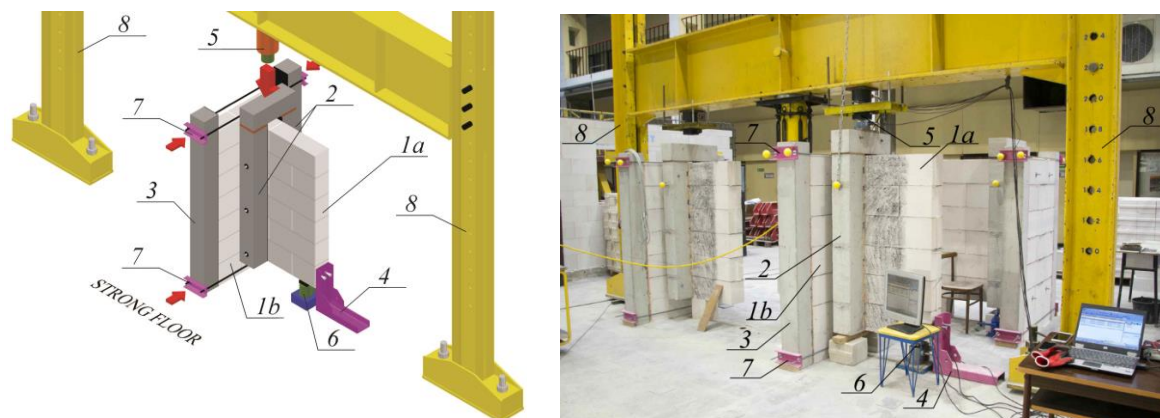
A scheme and photo of a test stand: 1a - longitudinal wall, 1b - transverse wall, 2 - reinforced concrete column transferring shear load, 3 - reinforced concrete pillars limiting horizontal deformation, 4 - horizontal support, 5 - system of the hydraulic cylinder and the force gauge used to induce shear stress, 6 - force gauge, vertical reaction, 7 - horizontal tie, 8 - steel frame
